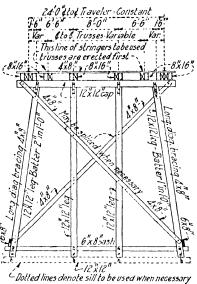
Through Bridge Traveler. American Bridge Company, (Traveler No. 1 in Fig. 23.)
